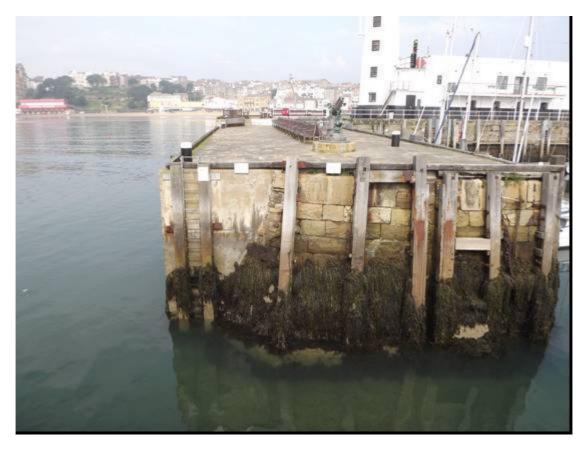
Vincent's Pier, end of Lighthouse Pier prior to construction of footbridge, showing batter of original masonry and vertical modern refacing (left)
